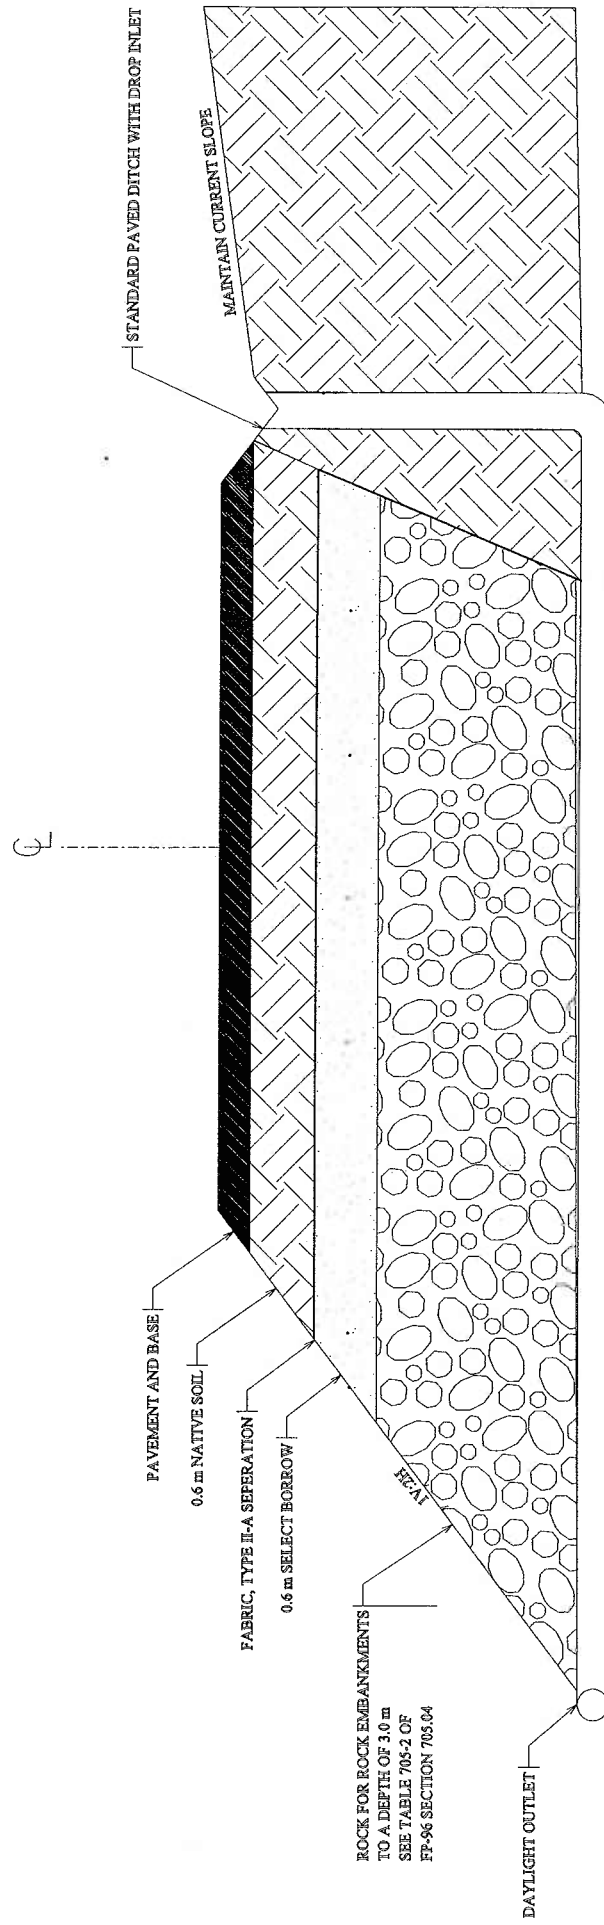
SUB-EXCAVATION SCHEMATIC FOR SITE B
